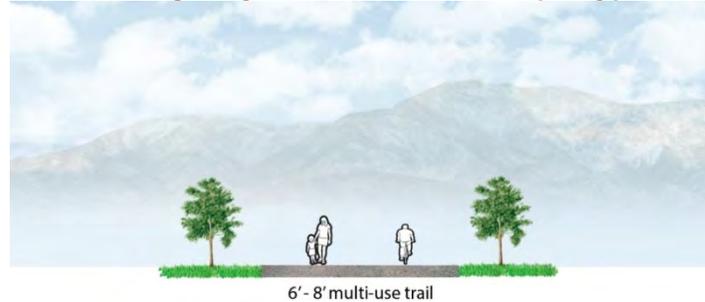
Off-Highway Trail (Route) Concept Typical Section
